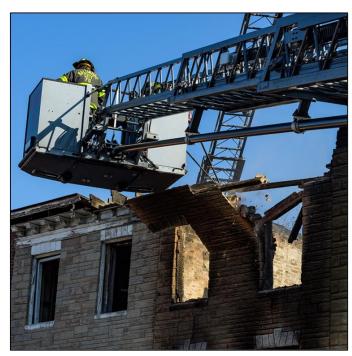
(left) and Photo 6 (right). Tower 1 firefighters were using 8-foot and 10-foot hooks to remove large sections of the Side Alpha wall. Contractors had made cuts in the Side Alpha wall with a circular saw.
